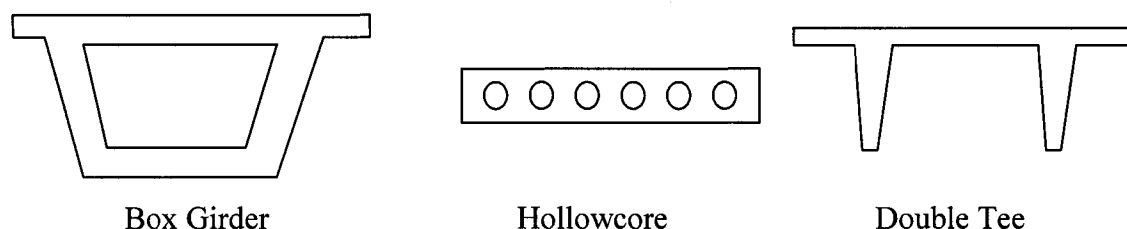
Cross-section of Common Precast Members Used as Part of a Slab/Diaphragm System.
